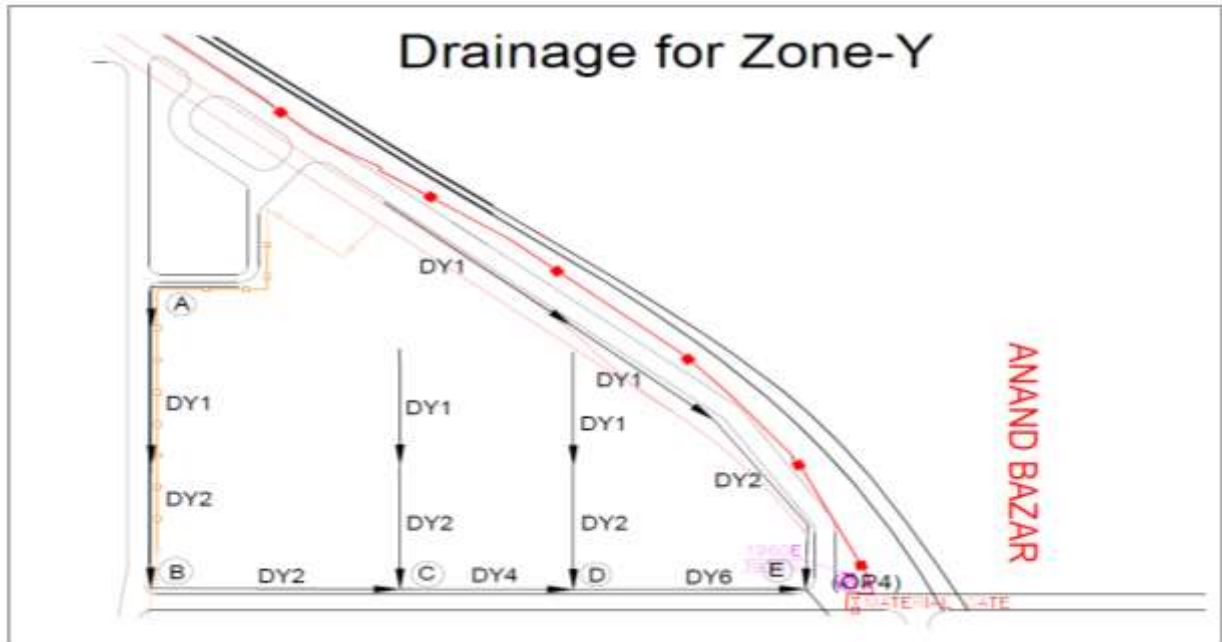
Y Zone drainage plan showing drains, longest flow path and outfall location
